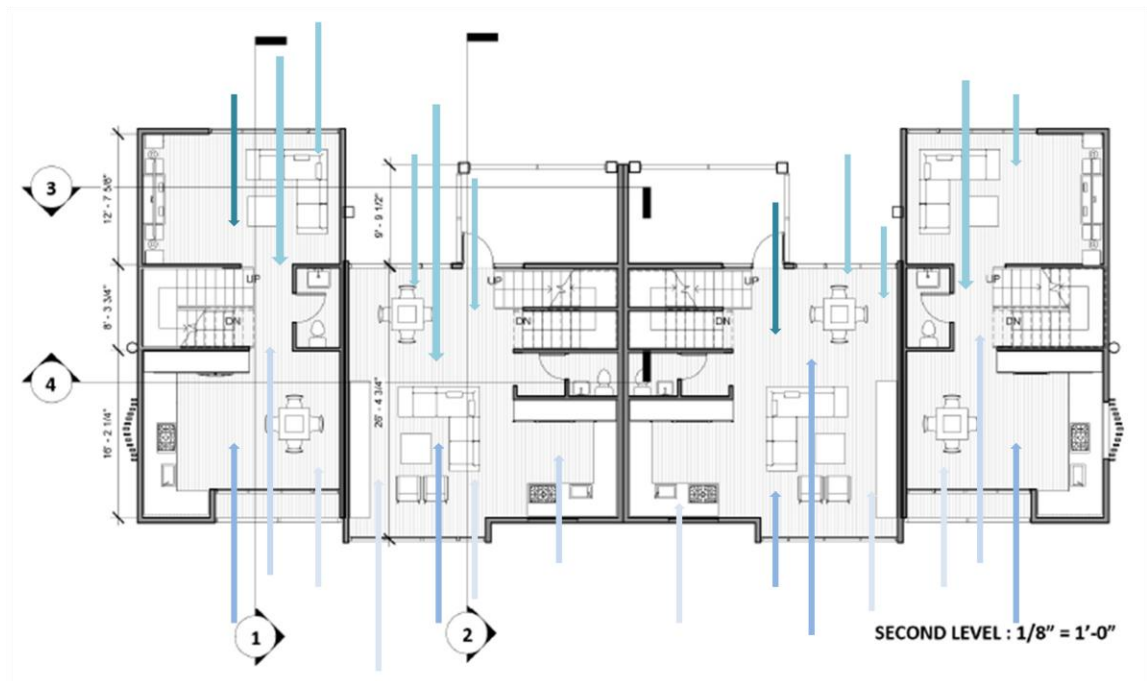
b: Possible manual natural ventilation for the second floor layouts
